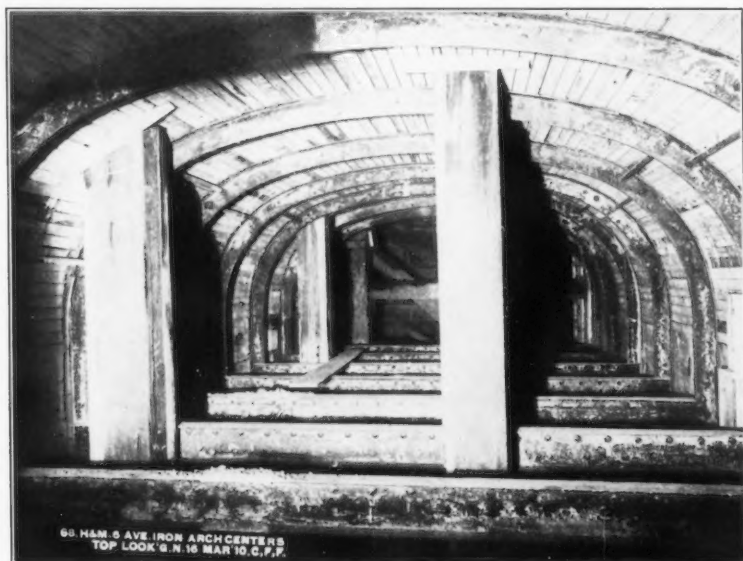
STEEL RIBS AND LAGGING OF FORMS IN STANDARD SUBWAY SECTION.
